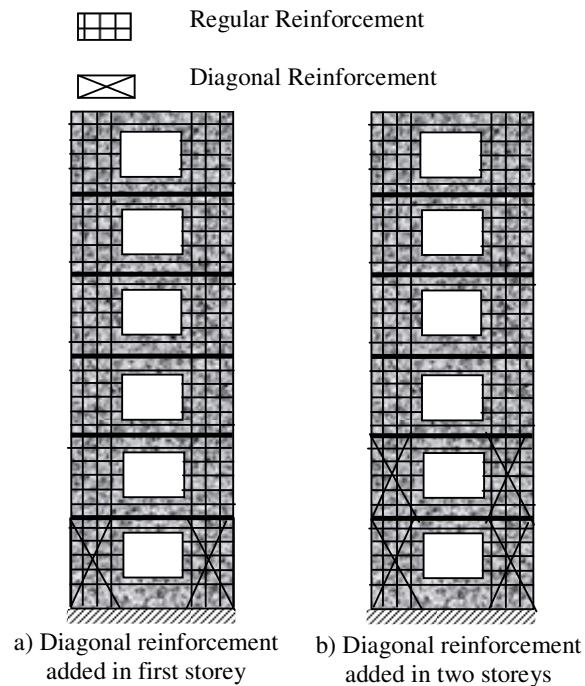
Effect of diagonal reinforcement on the structural response of shear wall
